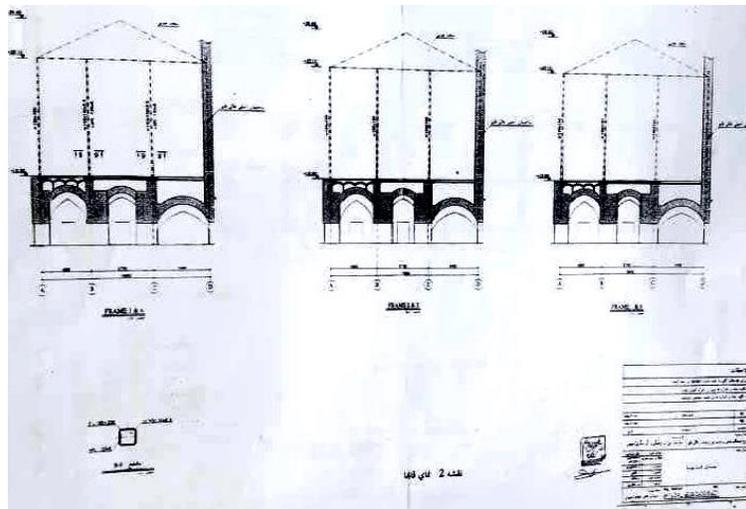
Strengthening plans and calculation of Ali Qapu Pavilion
